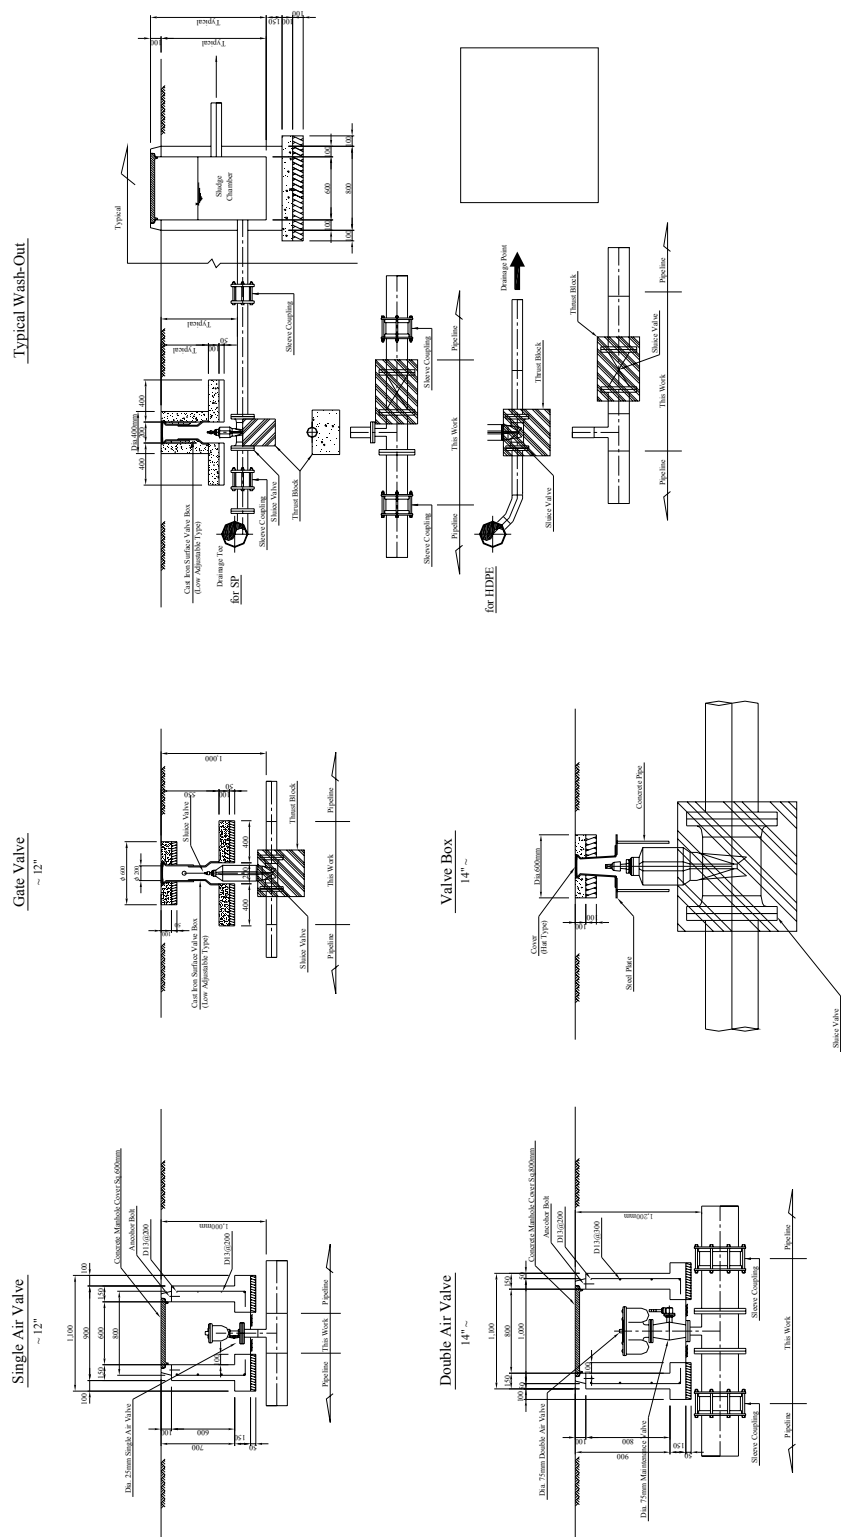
Standard Drawing of Valve Chamber of Large Diameter
